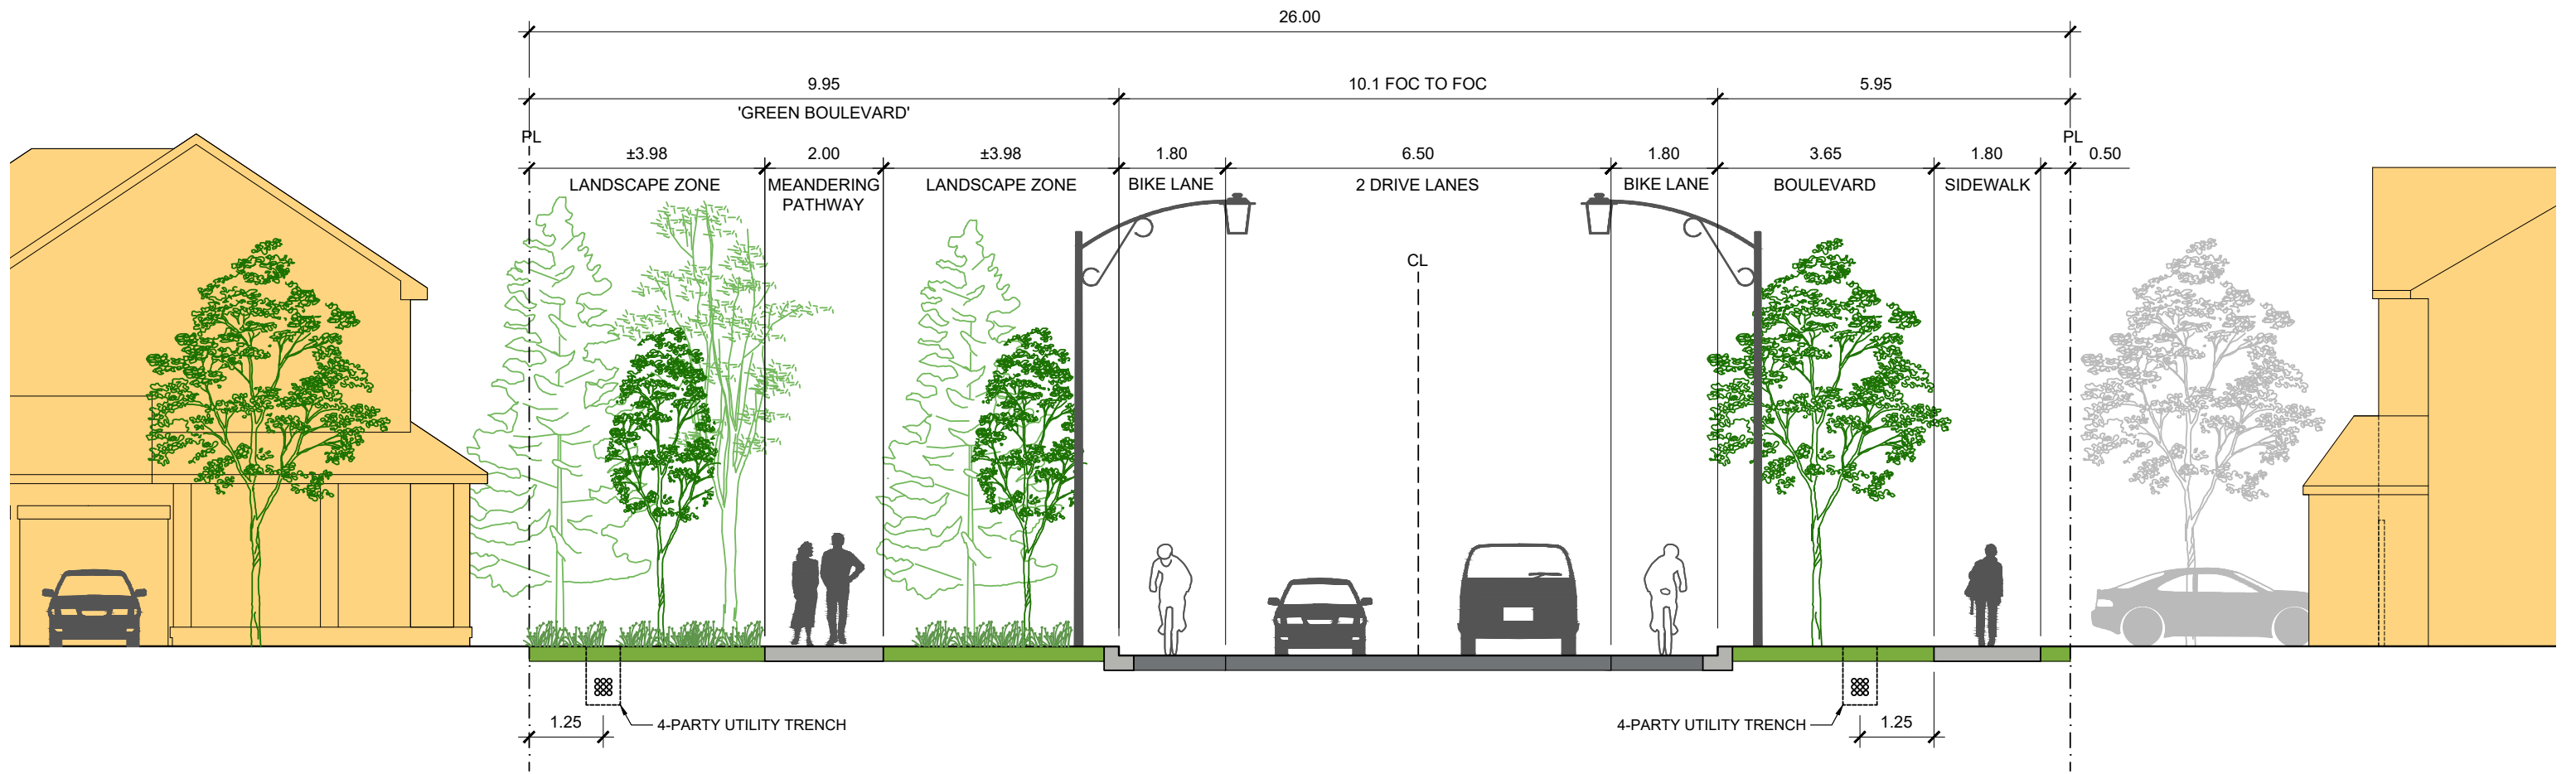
Alternate Neighbourhood Collector (26.0m Right-of-way) Cross Section
